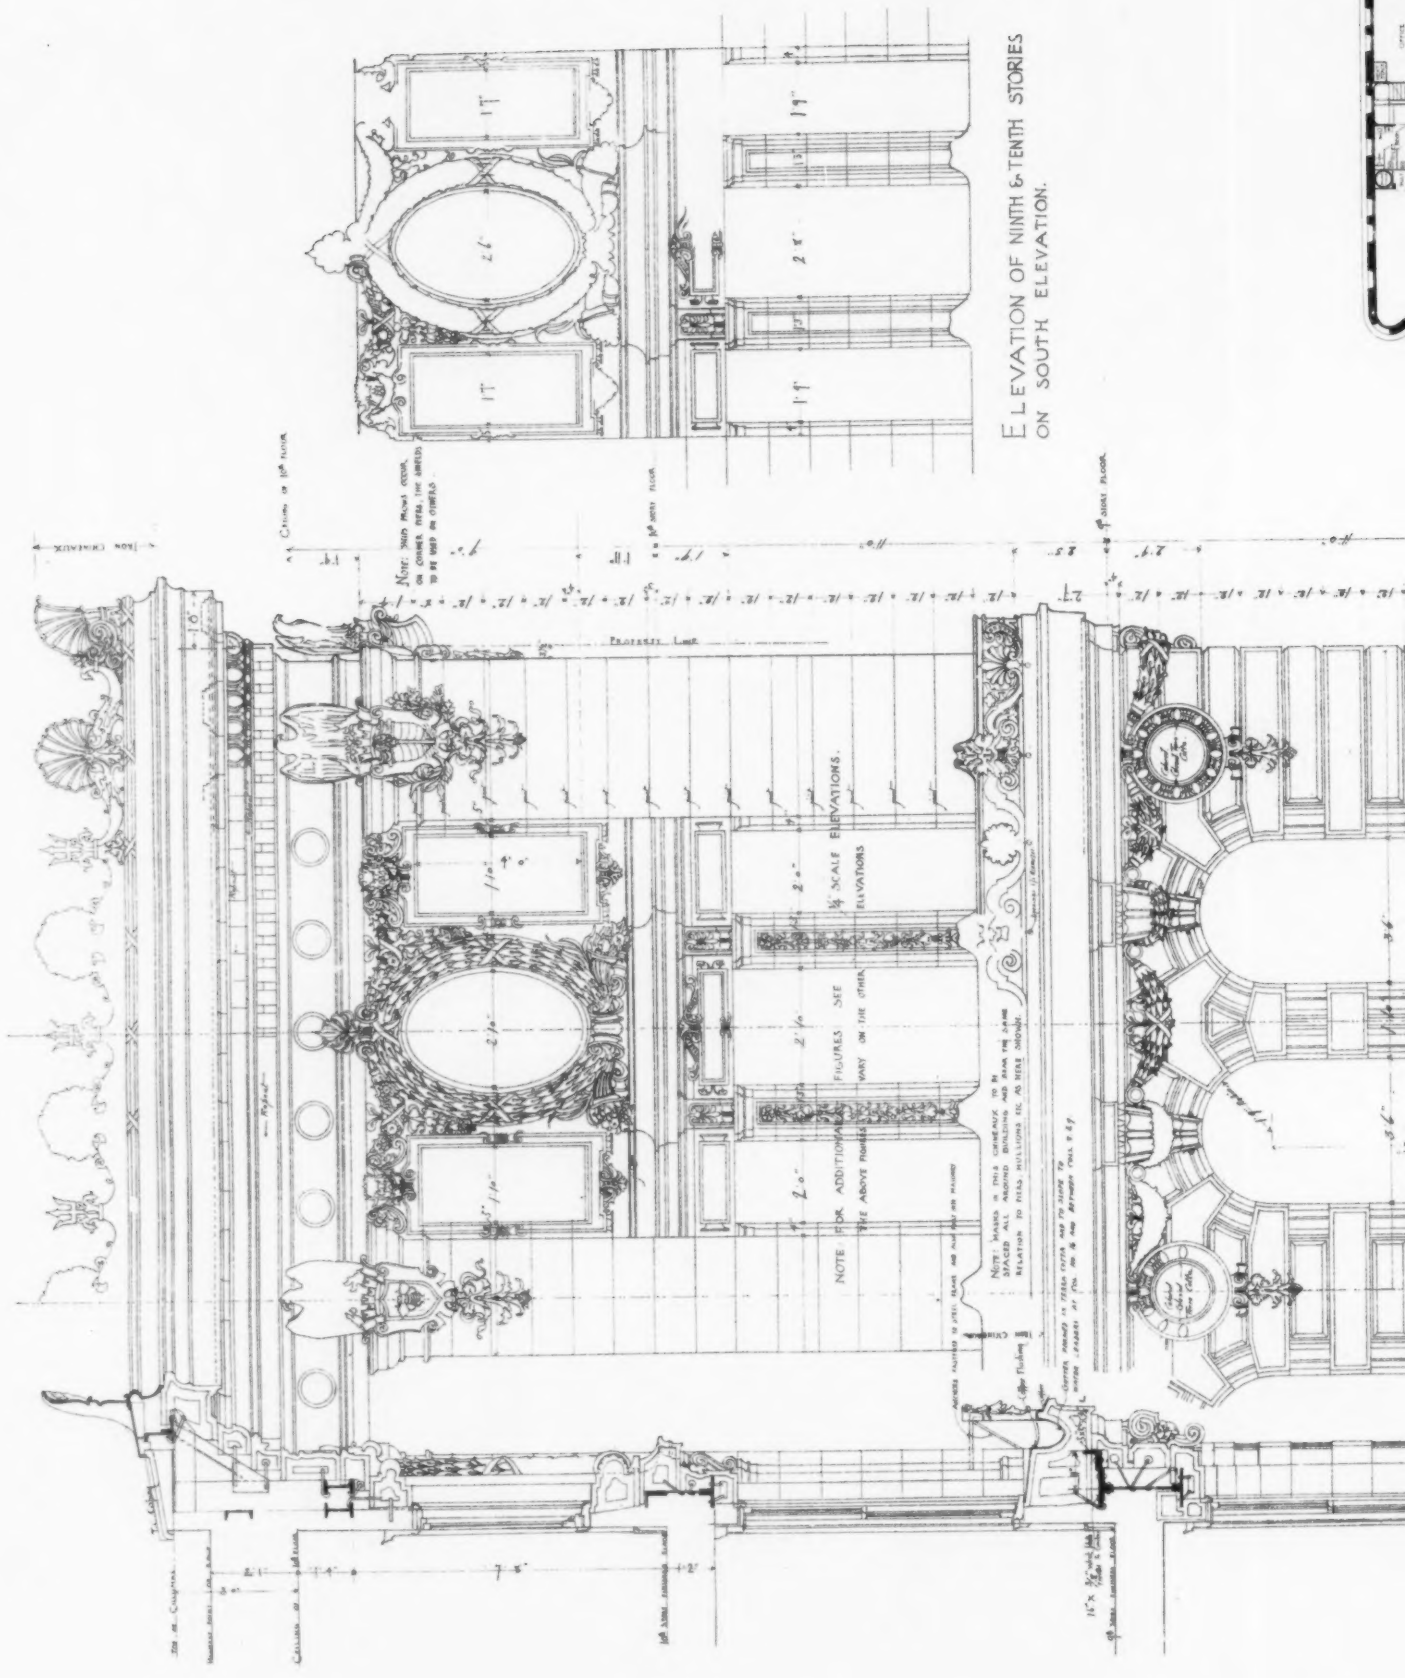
DETAIL OF TERRA COTTA WORK ABOVE SECOND STORY
